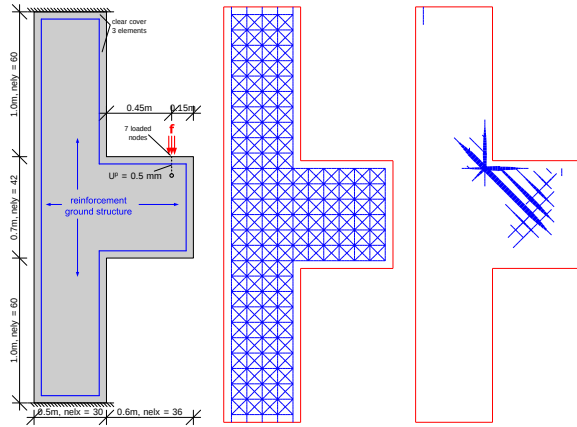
Reinforcement design for a 2-D corbel: problem setting, truss ground structure and optimized layout.
